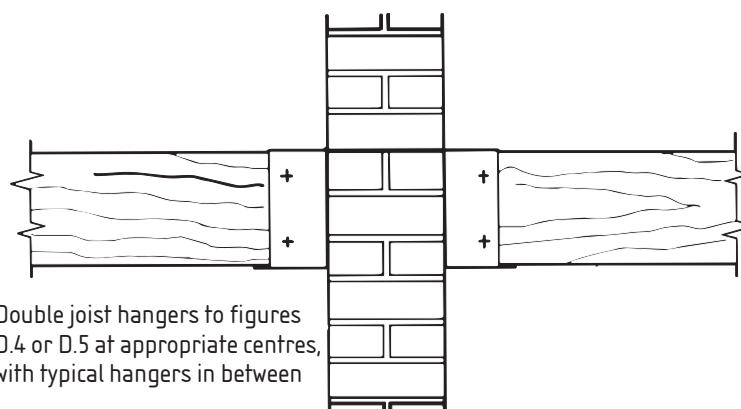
Timber floor using nailed or bolted joist hangers acting as tie
